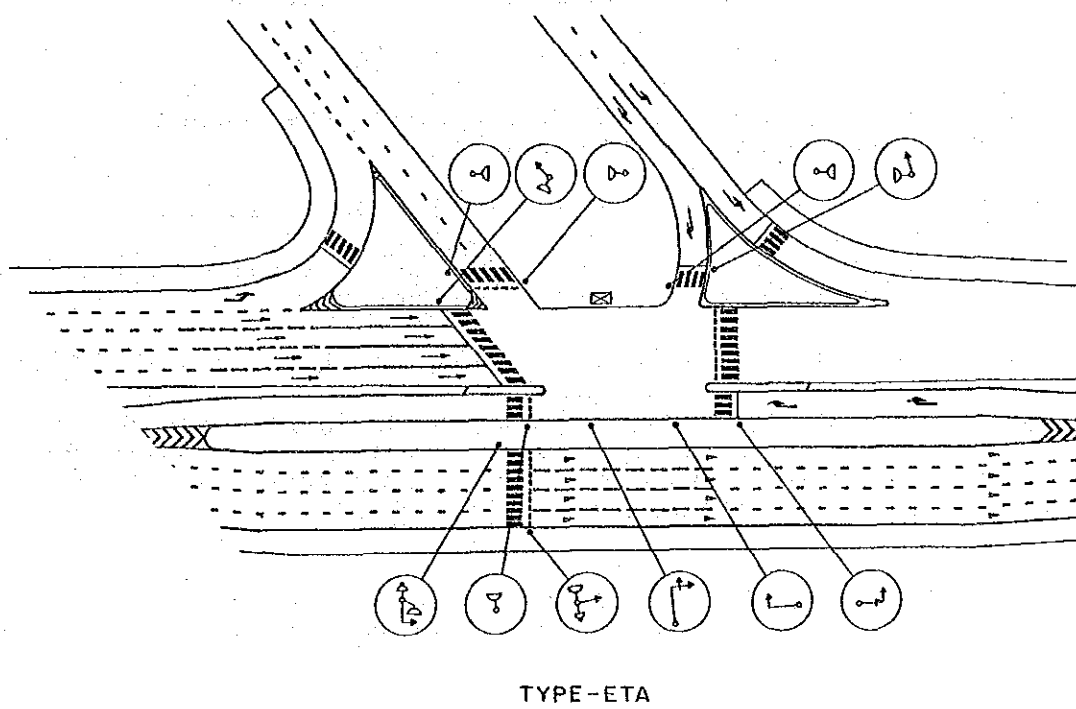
(4) Standard Installation Plan Around Intersection
